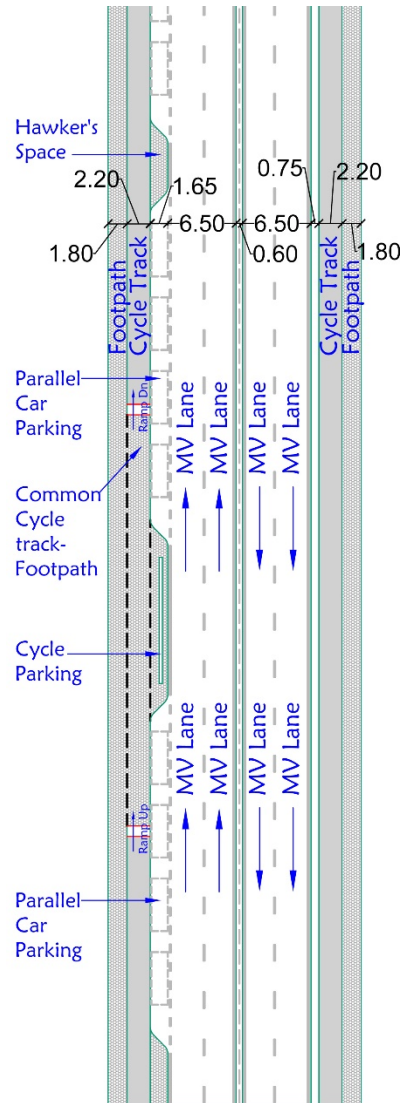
TYPICAL LAYOUT PLAN FOR 24M ROW
